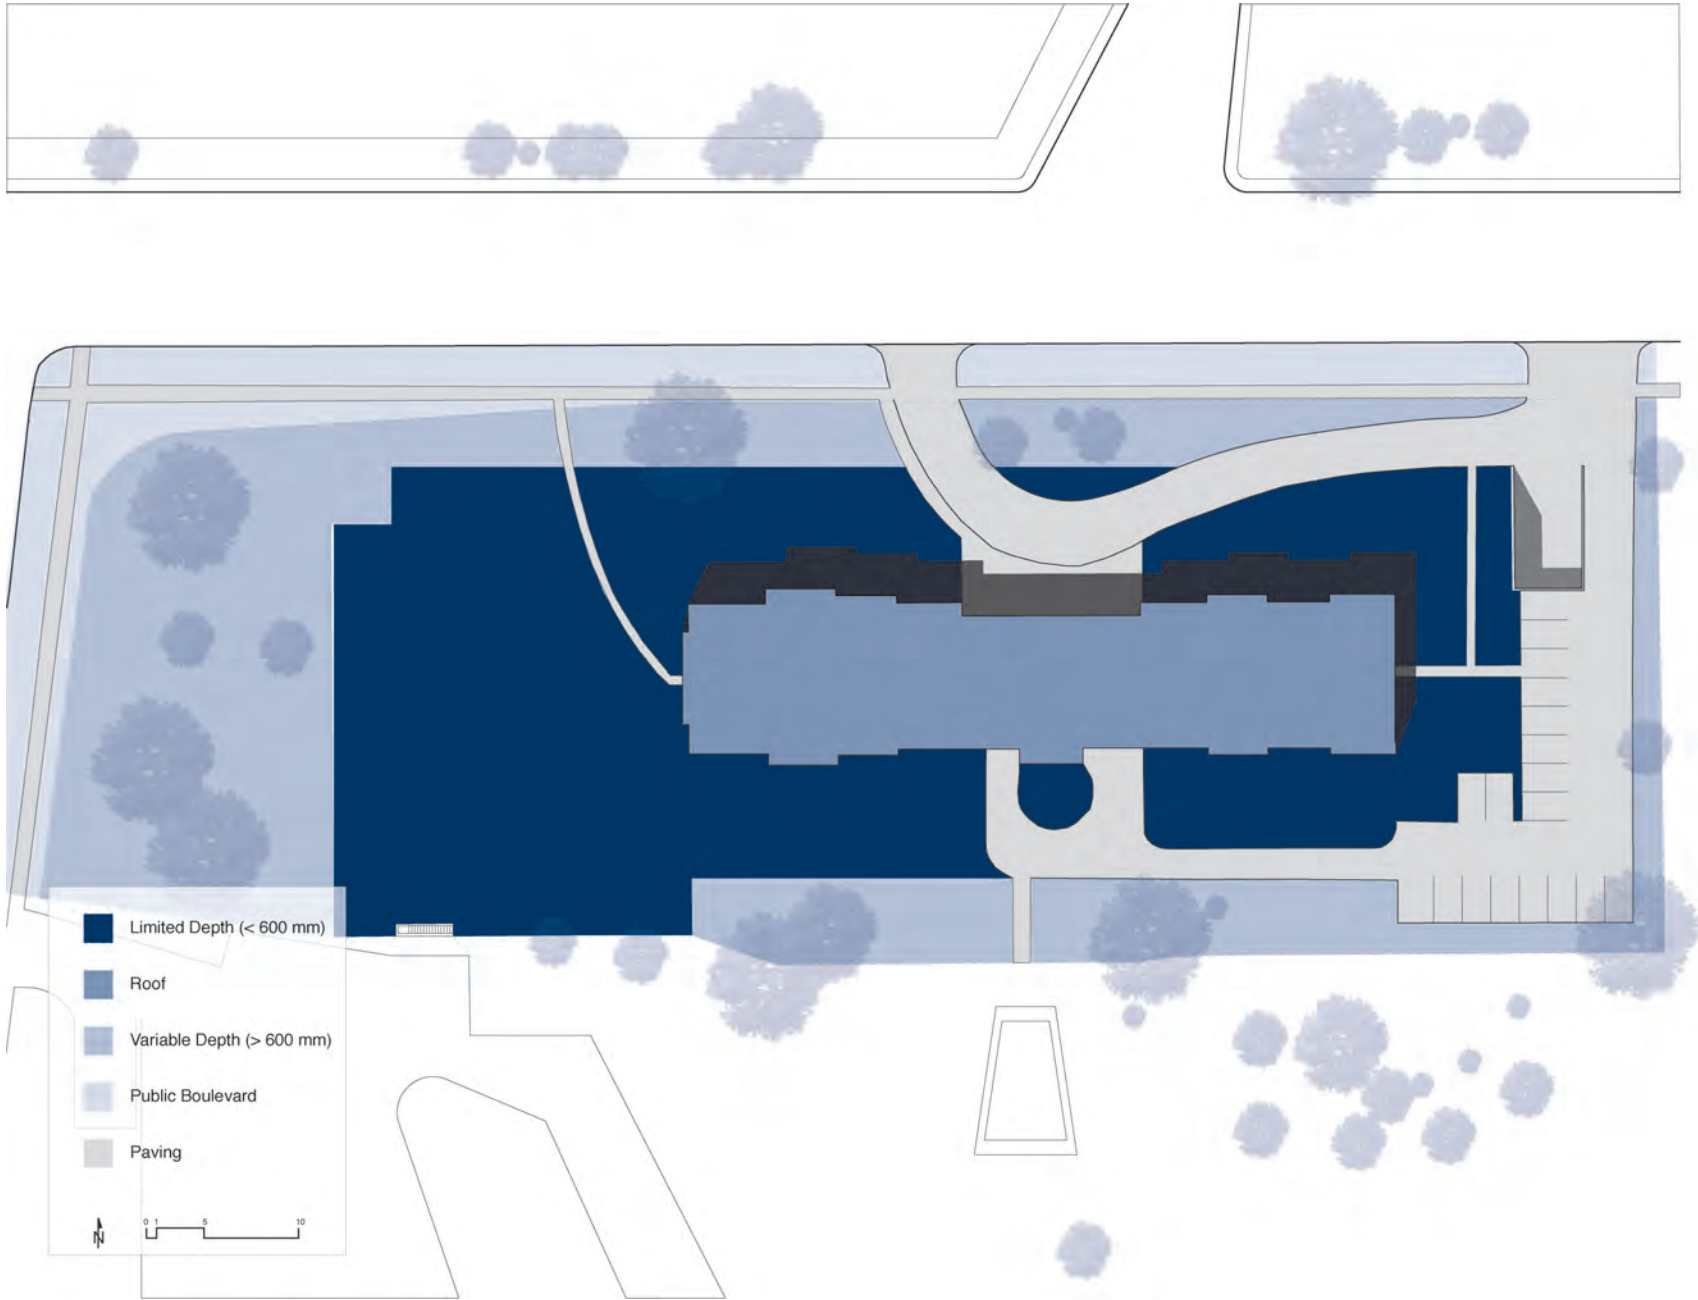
Tower B – Typical Suburban Site is an example of the most common tower development site found in many of the suburbs that sprang up after the 1950s. Extensive underground parking was preferred to deeper and more costly foundations having a smaller footprint.
